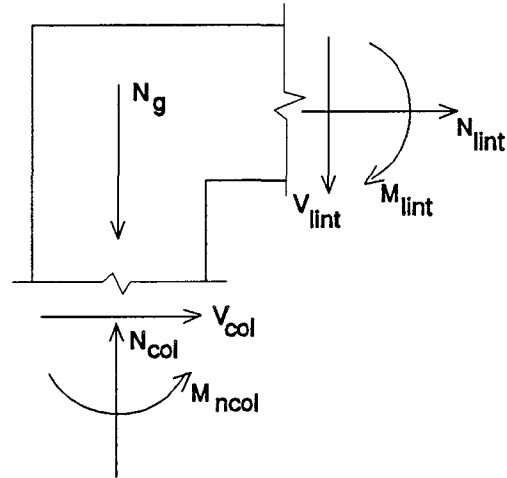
Forces acting on the roof lintel-pier connection of Specimen 1a
